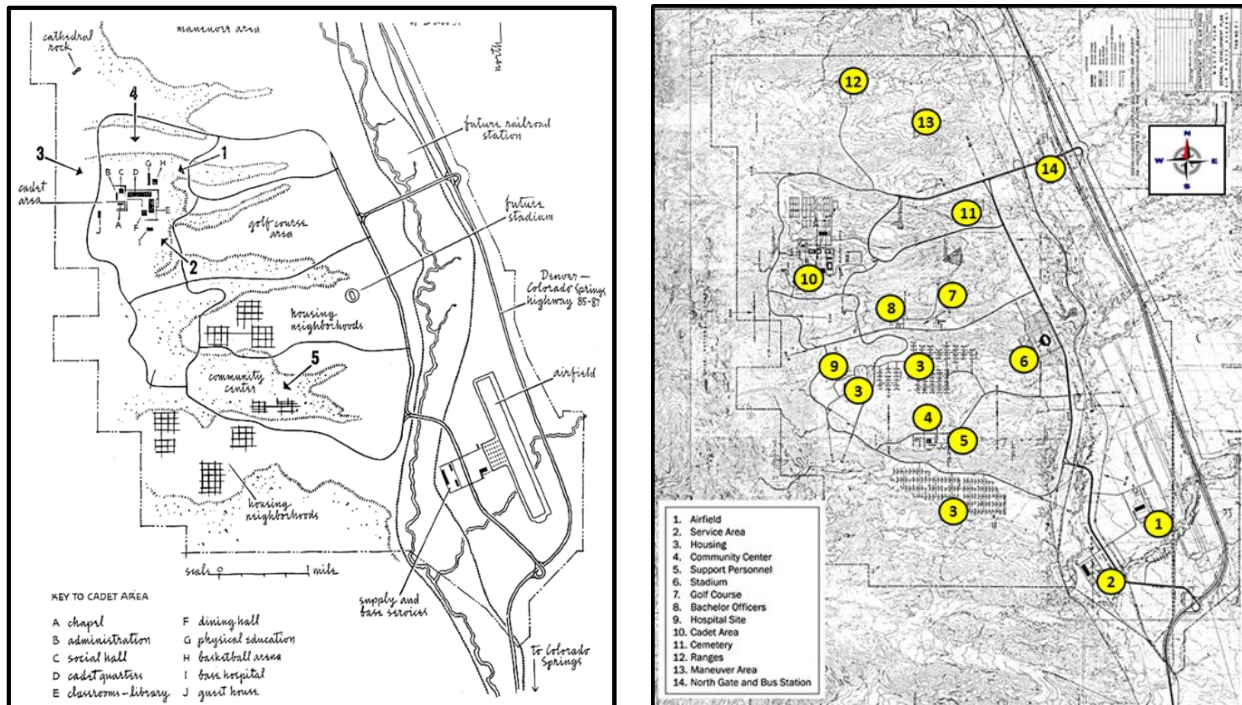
(Left) E.A. Bennett’s June 1955 illustration of the proposed USAFA site plan. (Right) SOM’s 1956 revised Master Plan.
